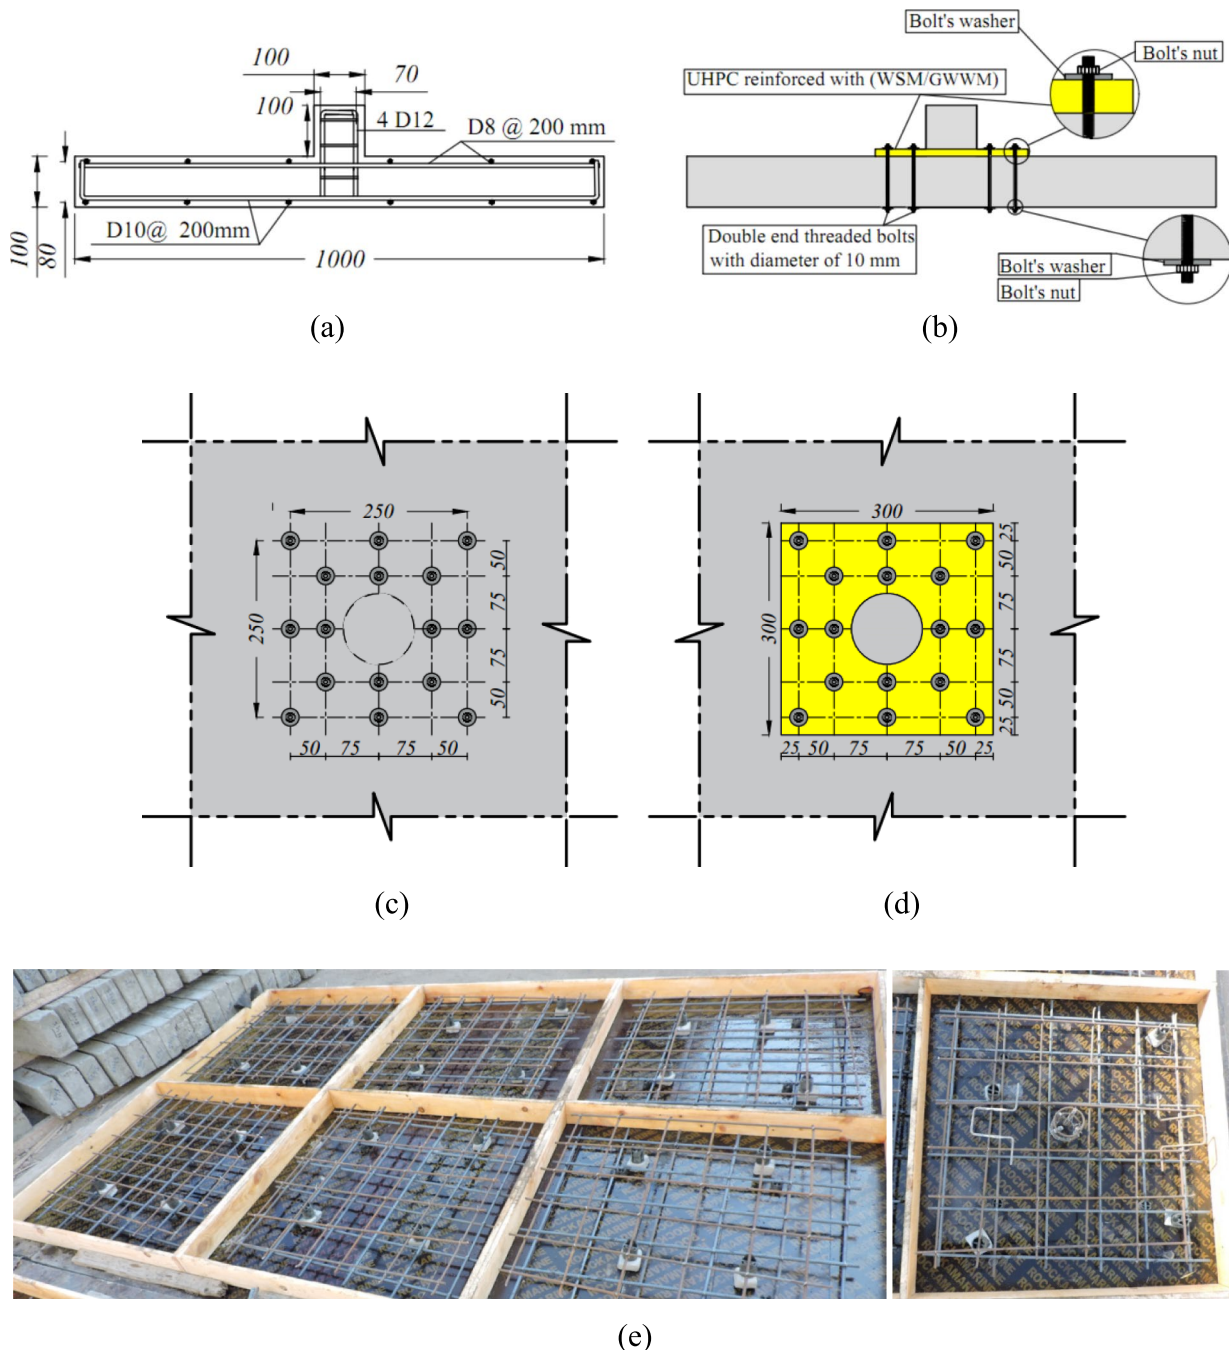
Description of the tested RC slabs: a reinforcement details of the slabs; b strengthening details; c view of the bottom surface with steel threaded bolt arrangement around the column; d view of the slab's top surface showing bolt arrangement and the UHPC layer; e photos of the formwork and reinforcement. (Units in mm)
